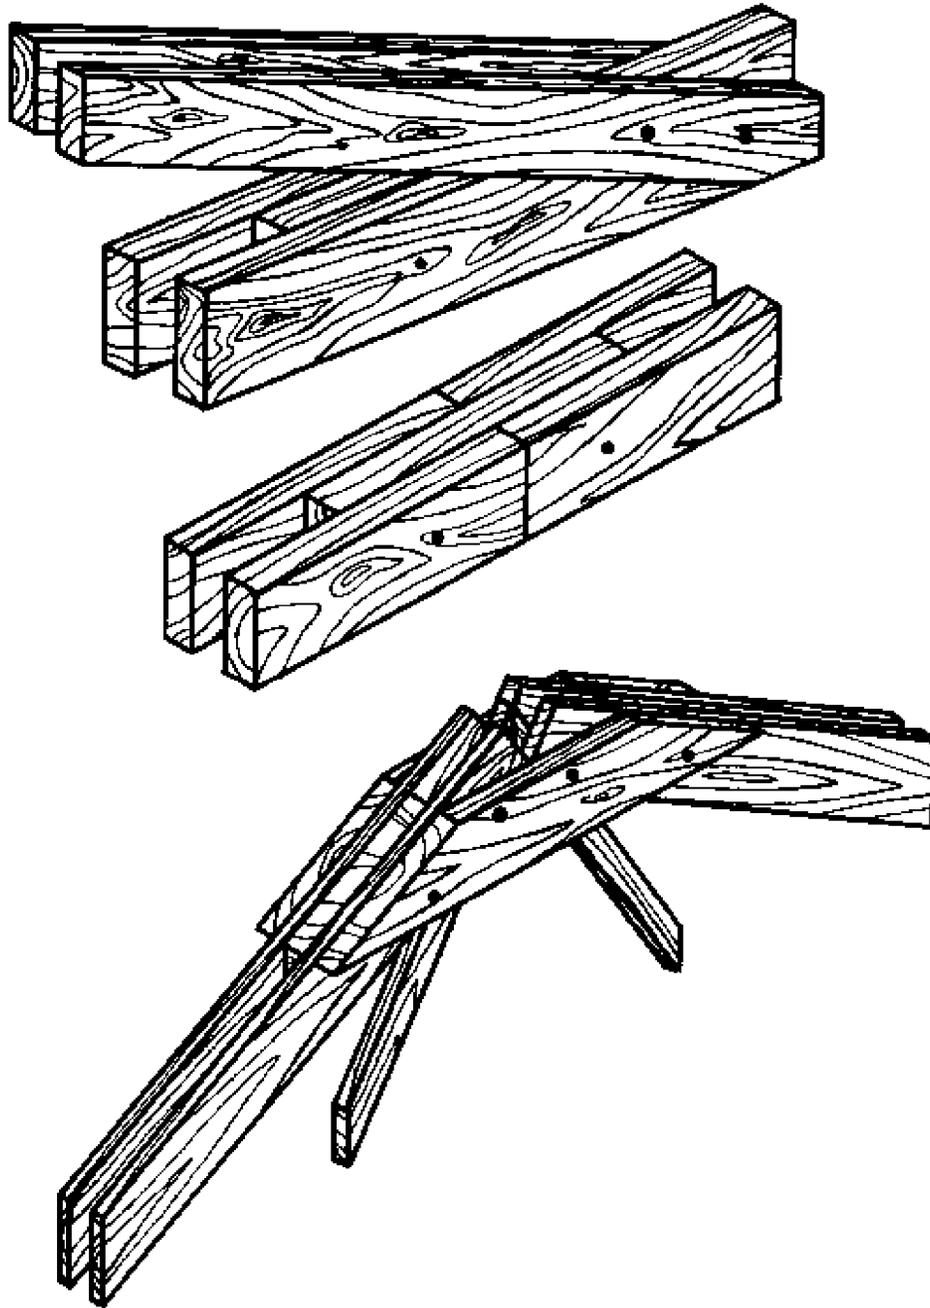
TYPICAL JOINTS IN TIMBER TRUSSES.
